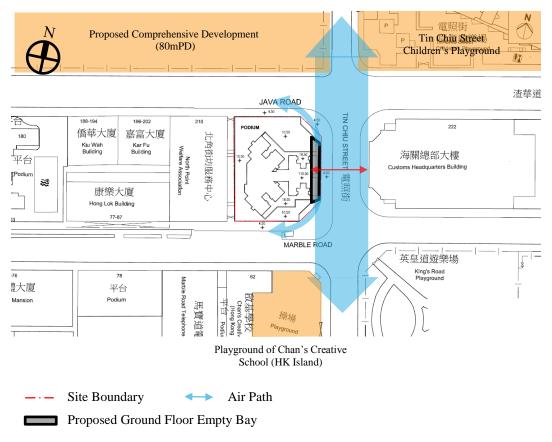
Recommended Location of Ground Floor Empty Bay (site layout subject to detailed design)
